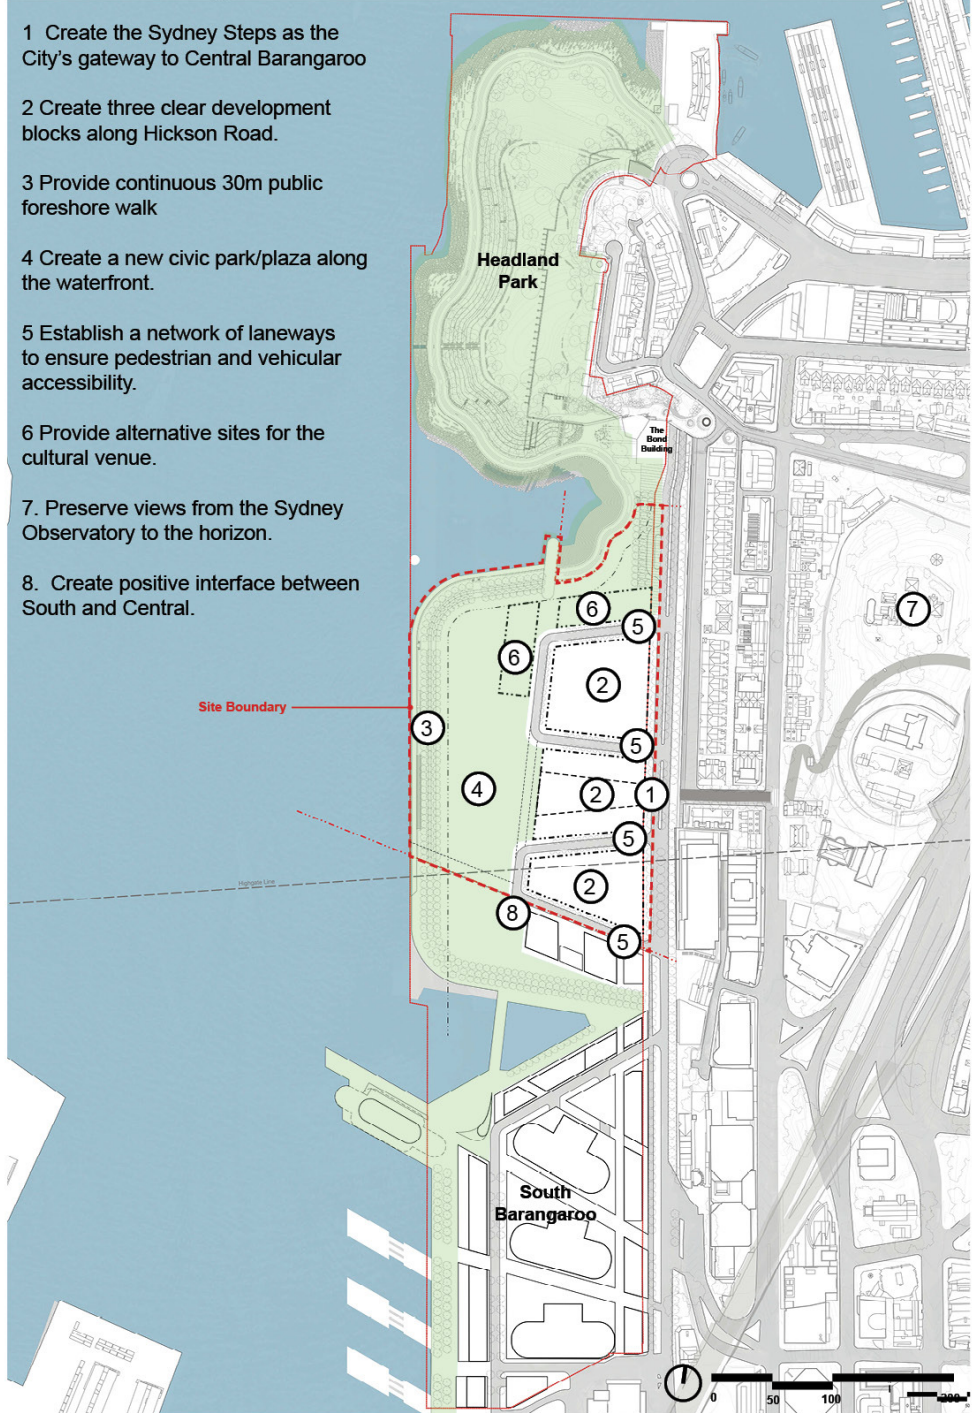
Central Barangaroo Framework Plan adjacent to existing Concept Plan for Barangaroo South (Modification 4)
